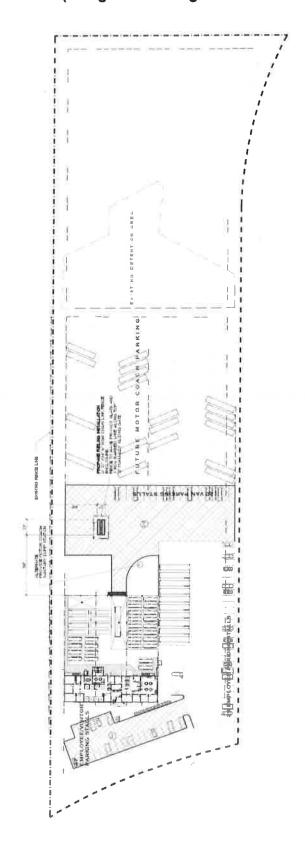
Site Plan (Designated Storage Areas Ord. 2619)
